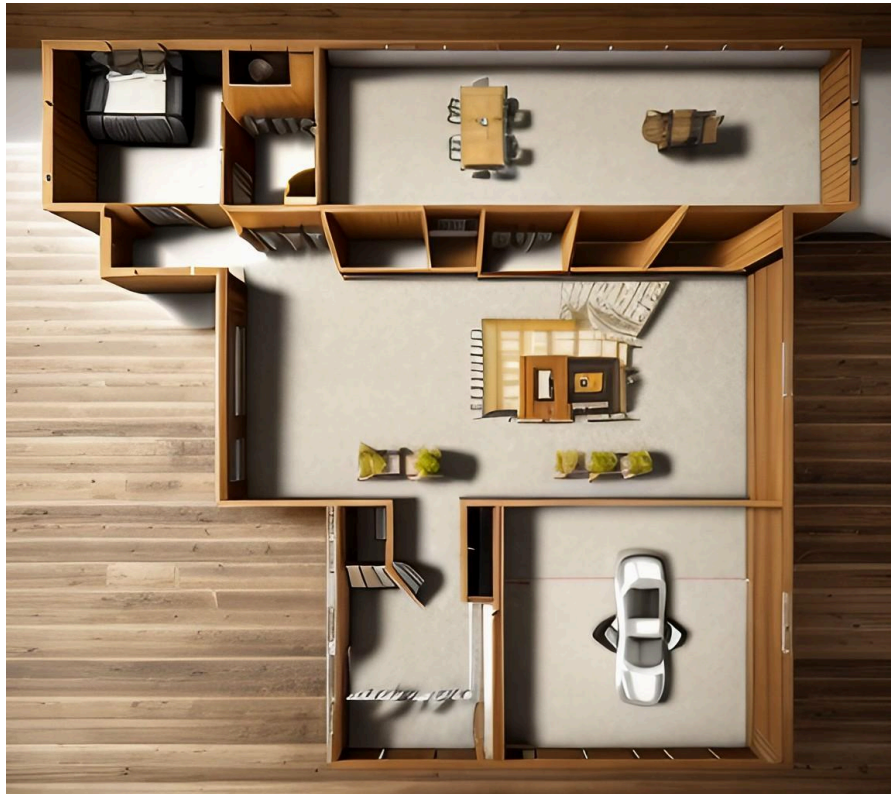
Maket Rendered Floor Plan Credit: Author
